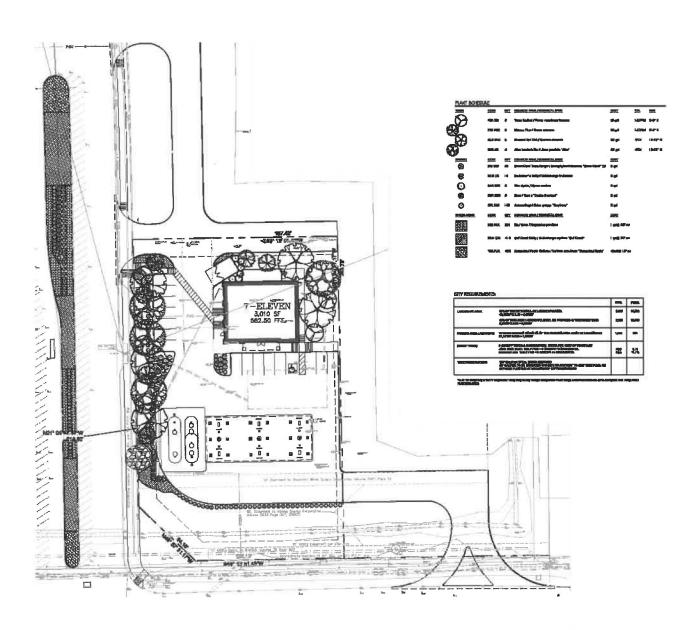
EXHIBIT 'G':Concept Plan and Elevations from Ordinance No. 12-13
